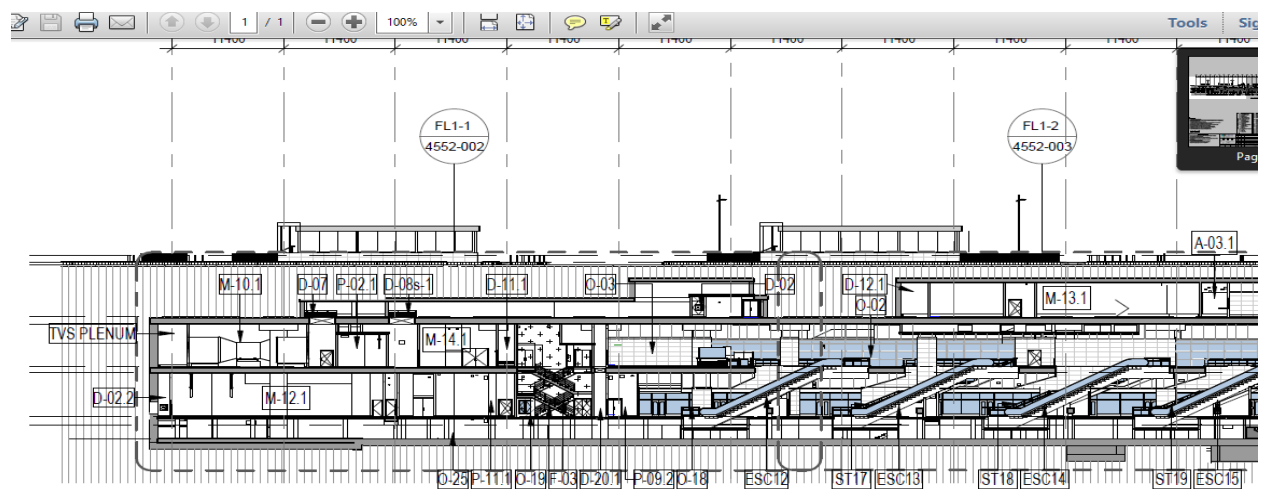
Layout(Sectional) of a typical Underground Metro Station Platform Area
